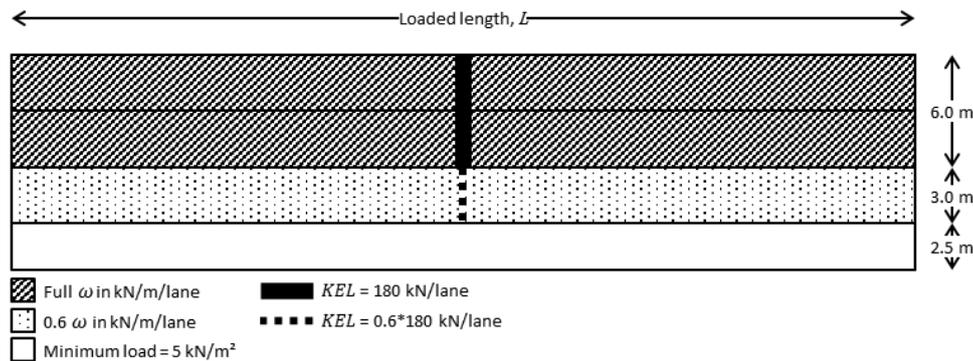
Load distribution plan on a bridge with 11.5 m carriageway (Study ‘16) [15]
